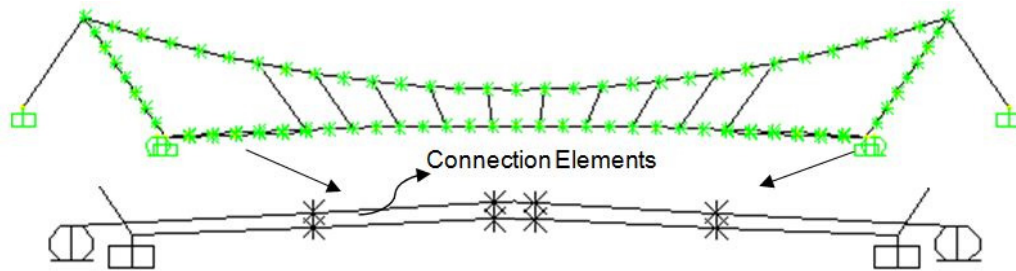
Two-dimensional finite element model of Halgavor suspension footbridge
